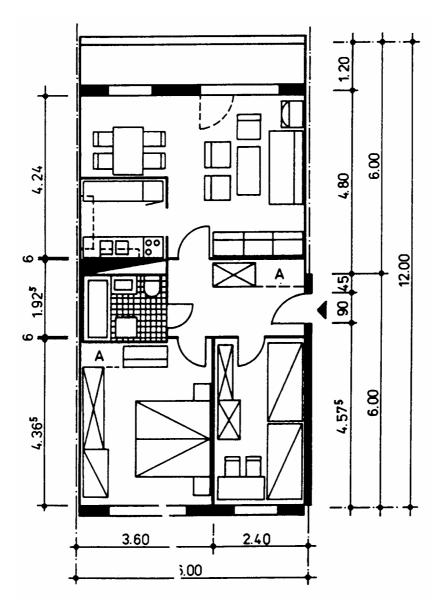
Typical ground plan of a WBS 70 - 3-room-apartment with kitchen without window
